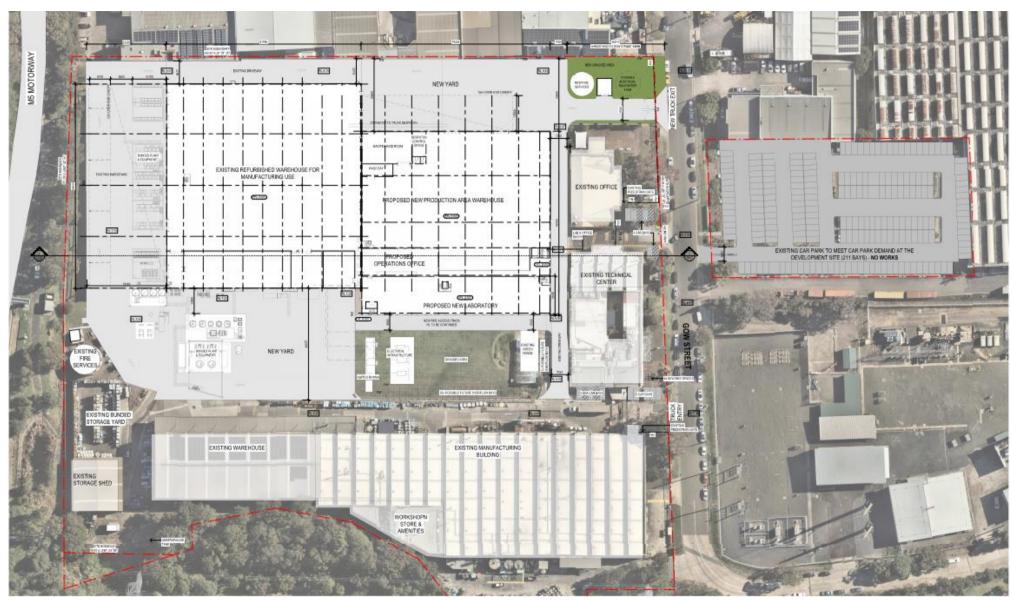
Proposed Site Plan (Source: Watson Young, 2024)
